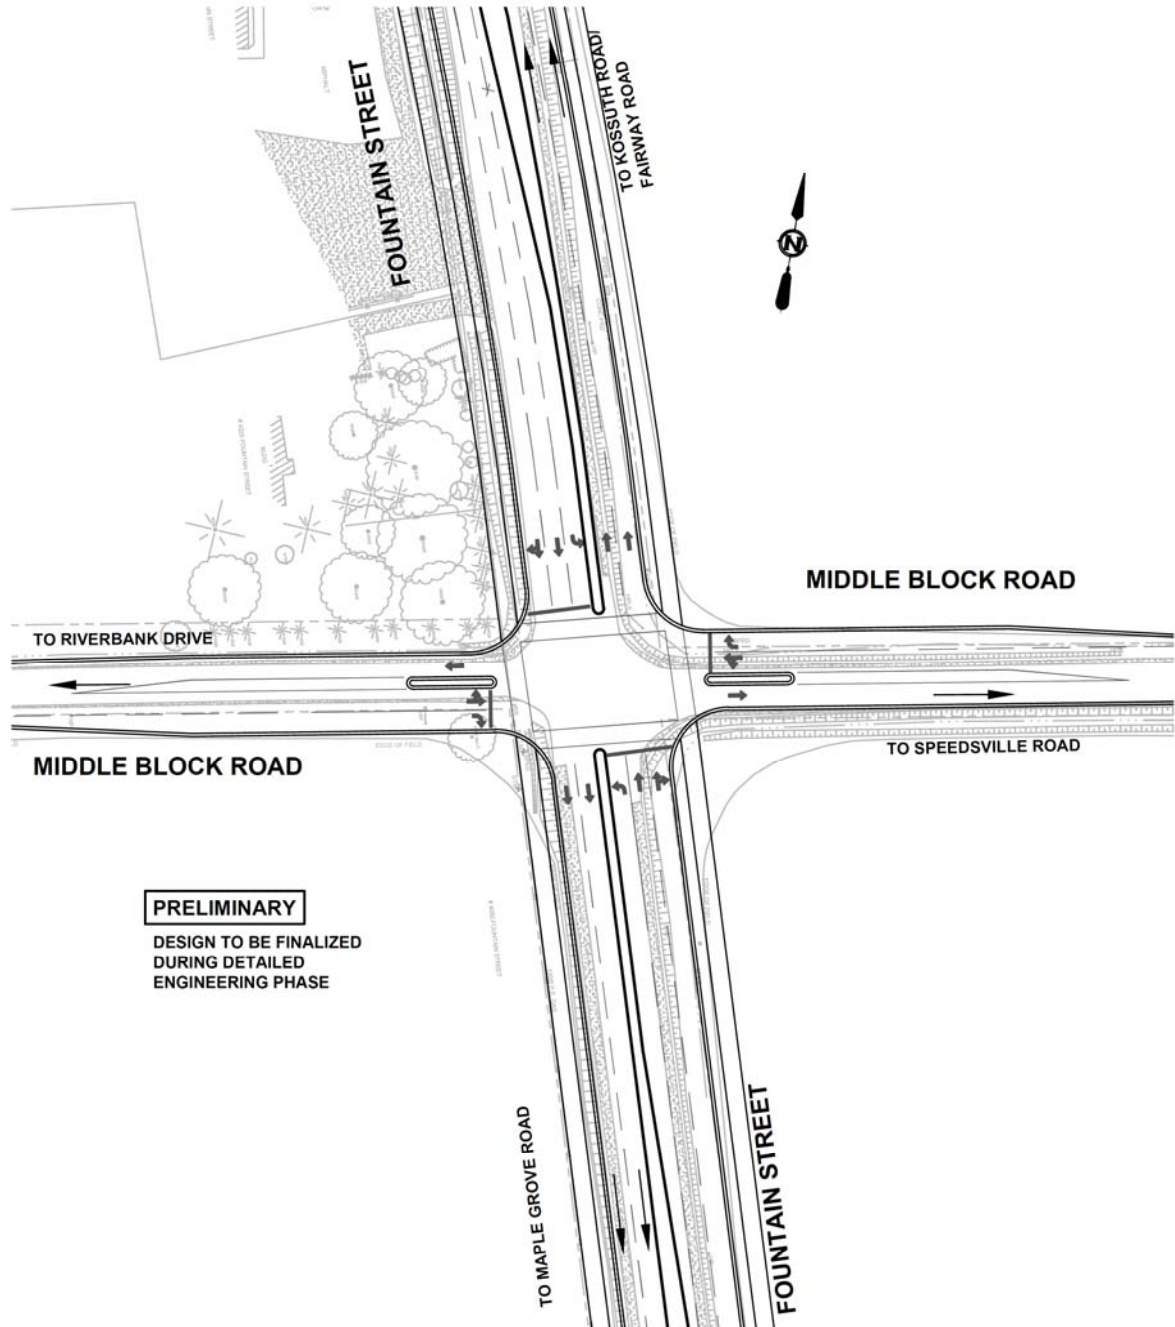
A Signalized Intersection Option at Fountain Street and Middle Block Road
